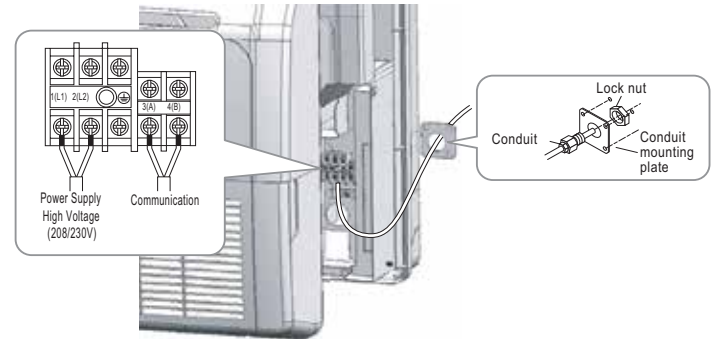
Simplified View of Indoor Unit Terminal Connections--Floor Standing.
